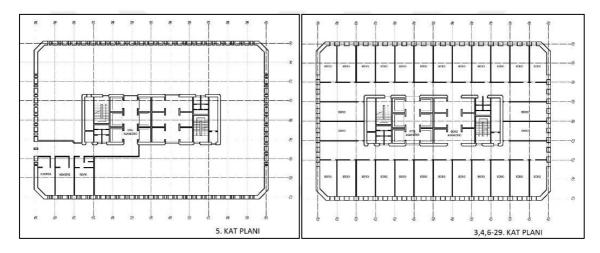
Third to twenty-ninetieth floor plans of Mersin Metropol Building
